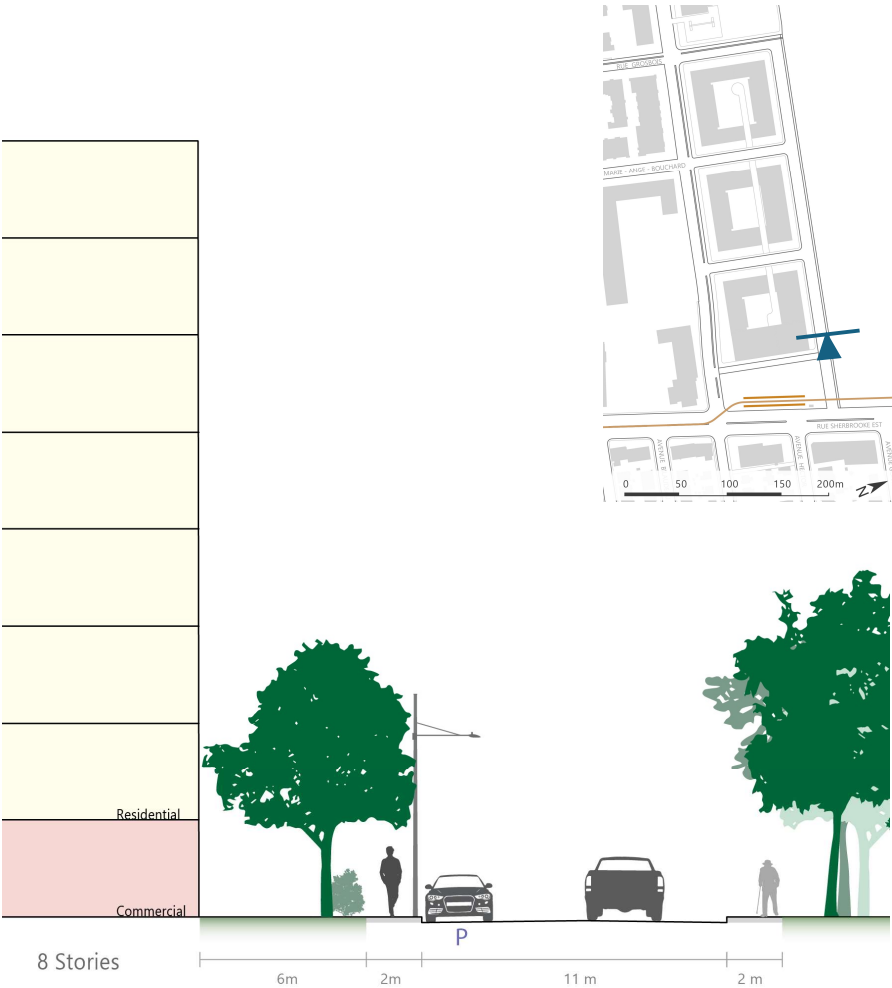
Cross section quarry-park facing blocks (Authors, 2024)
